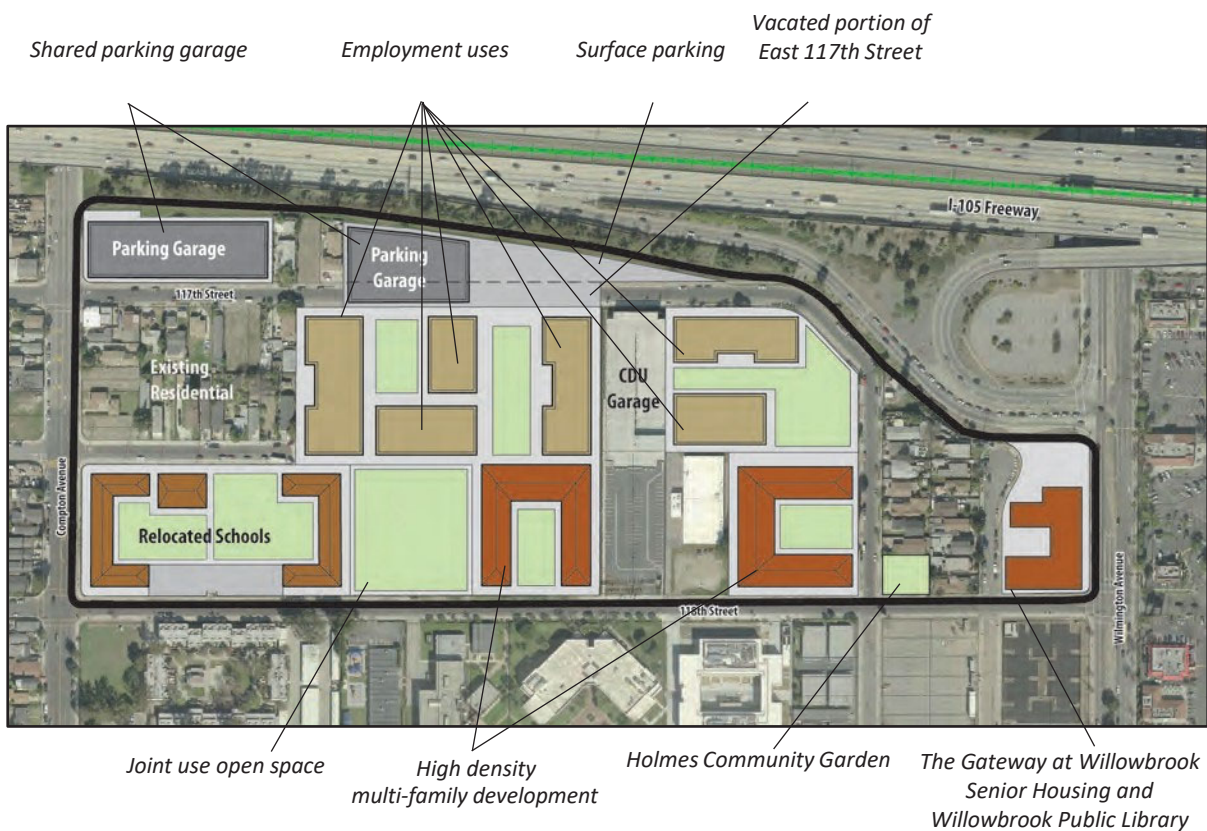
Illustrative Site Plan for the Northwest Subarea
